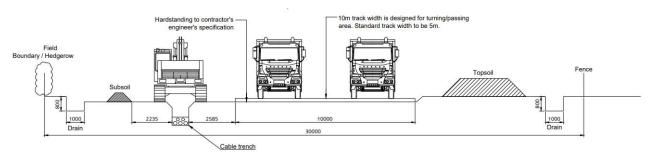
Typical construction swathe for off-road sections (30m wide corridor)
